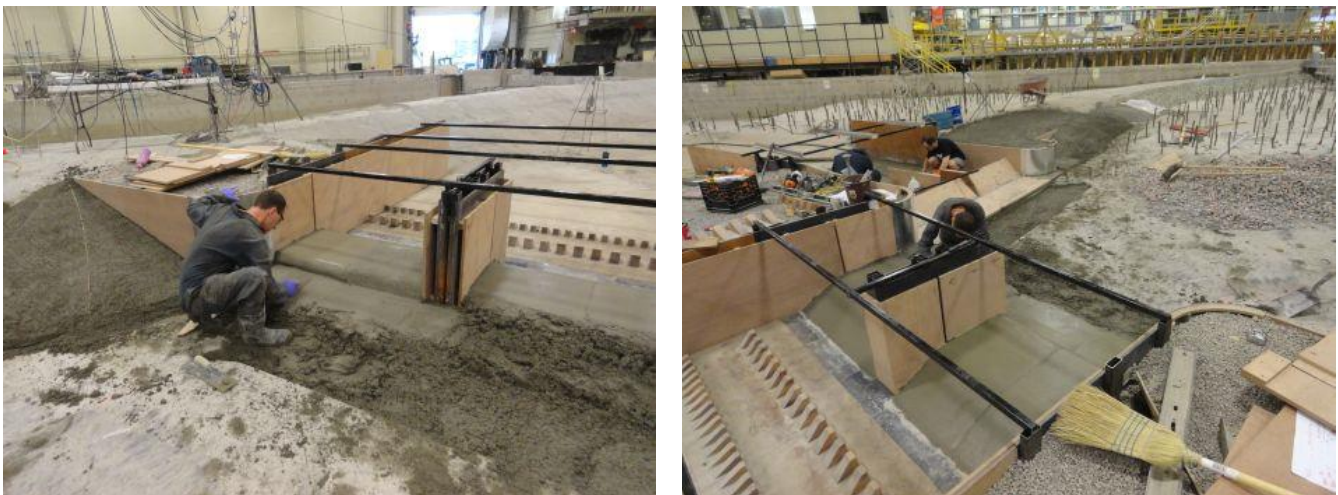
Pouring the concrete for the embankment, diversion inlet apron, and the bottom of the new riprap pit.
